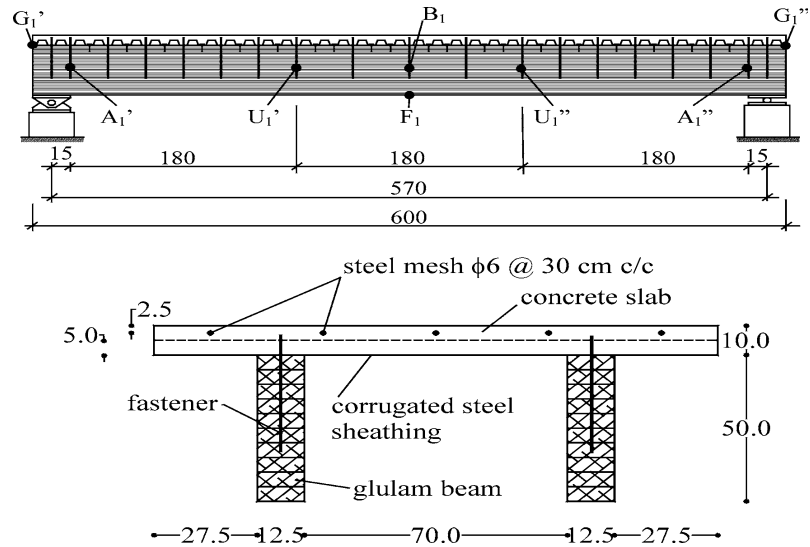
Longitudinal view and cross-section of the composite beam tested by Ceccotti et al. (2006) (dimensions in cm)
